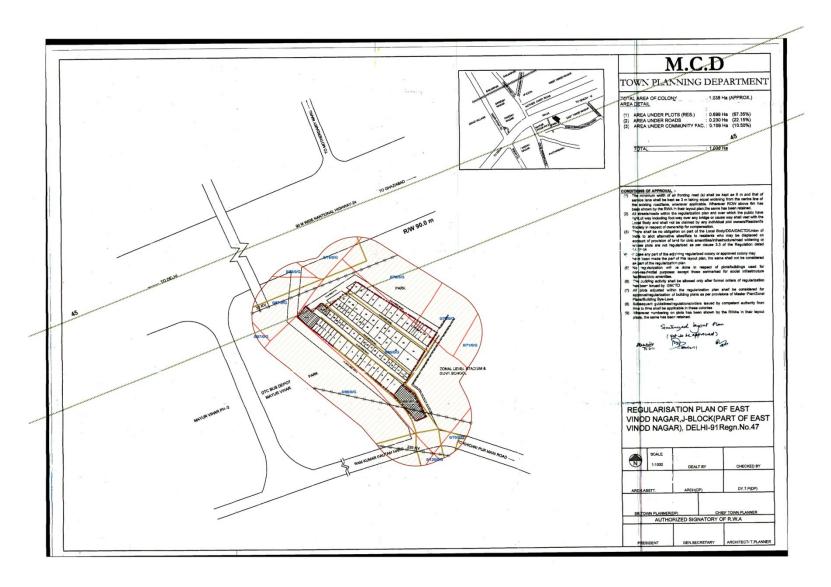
Layout Plan example from Zone E. Source: DDA Layout Plans.
